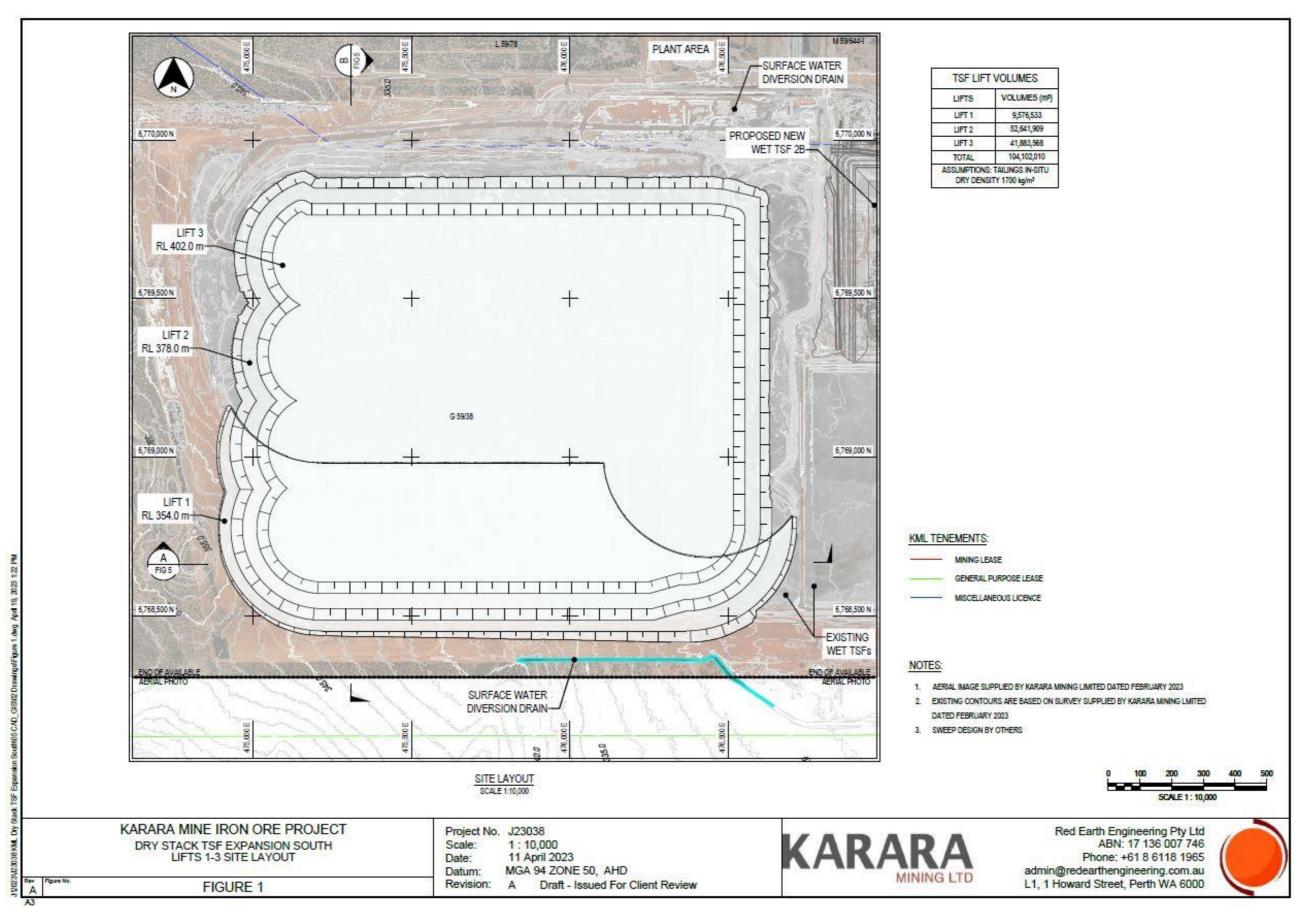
Construction plan of the dry-stack TSF perimeter expansion and subsequent lifts.
